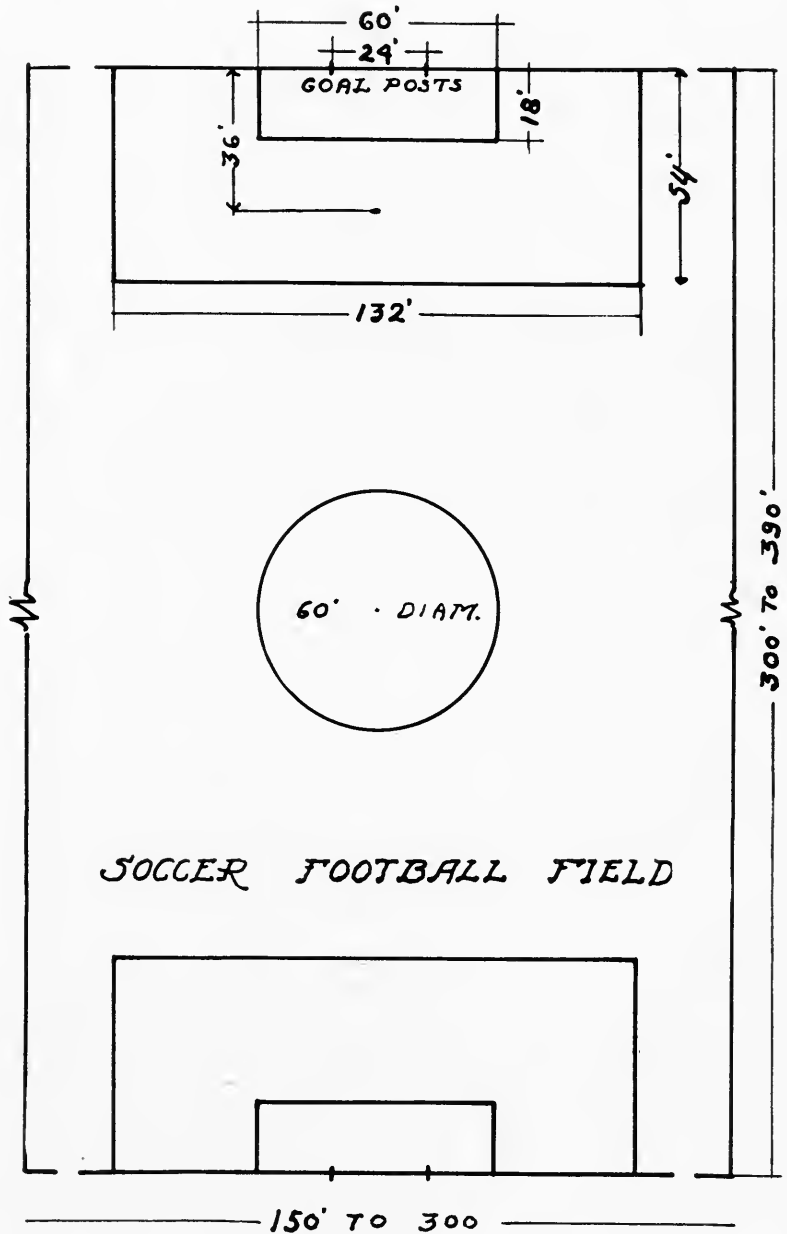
DIAGRAM FOR LAYING OUT SOCCER FIELD
